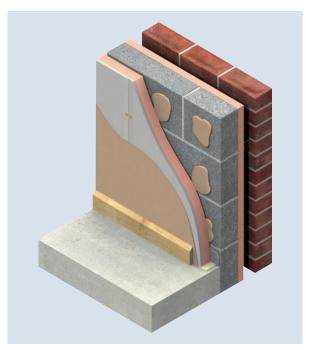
Kingspan* Kooltherm[®] K118 Insulated Plasterboard installed with Drywall Adhesive Bonding
